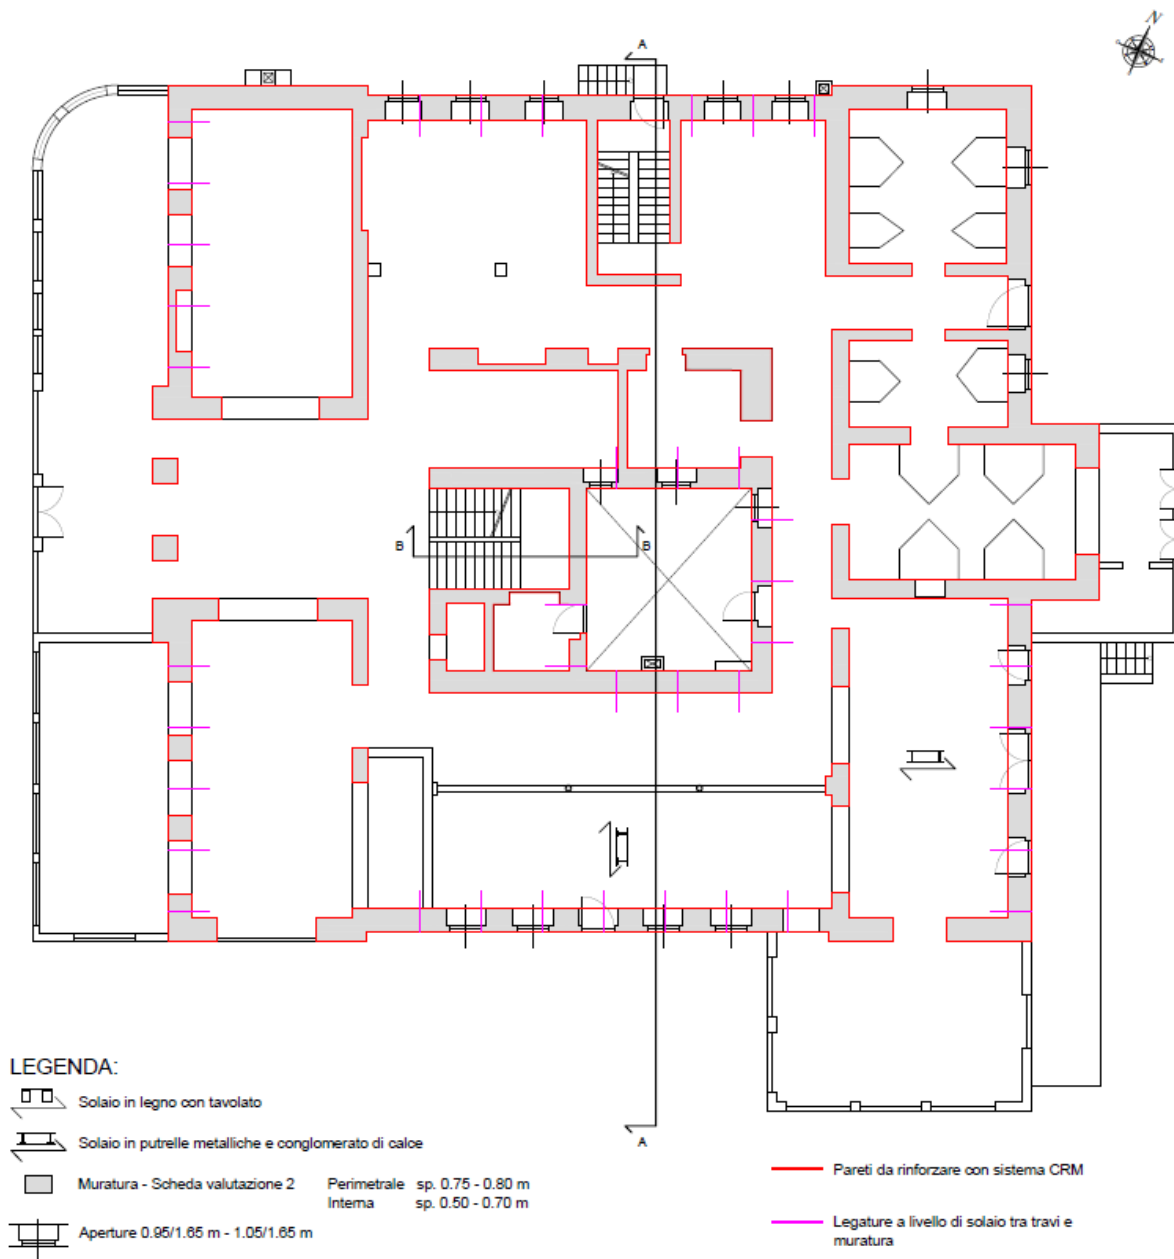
Floor plan - intervention R2 (red lines depict coating)
